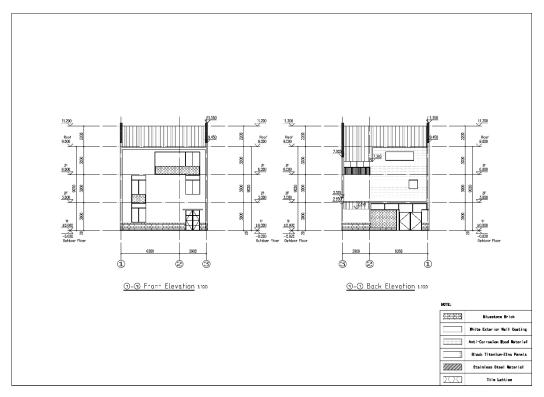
The Front Elevation and Back Elevation of Sample Building No. 1 (Drawn by the author)
